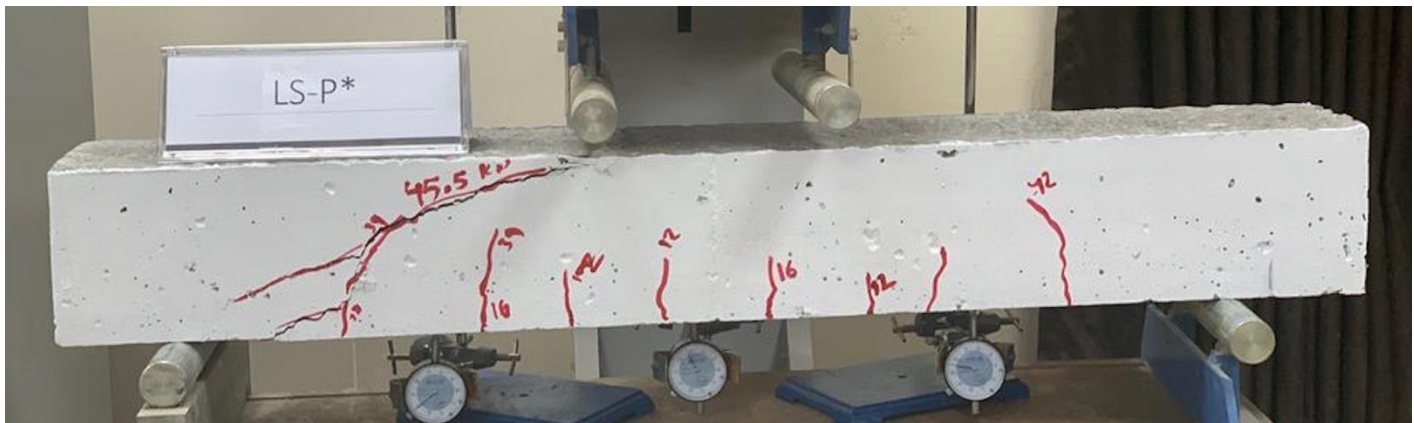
Crack Pattern at Failure of Beam LS-P
